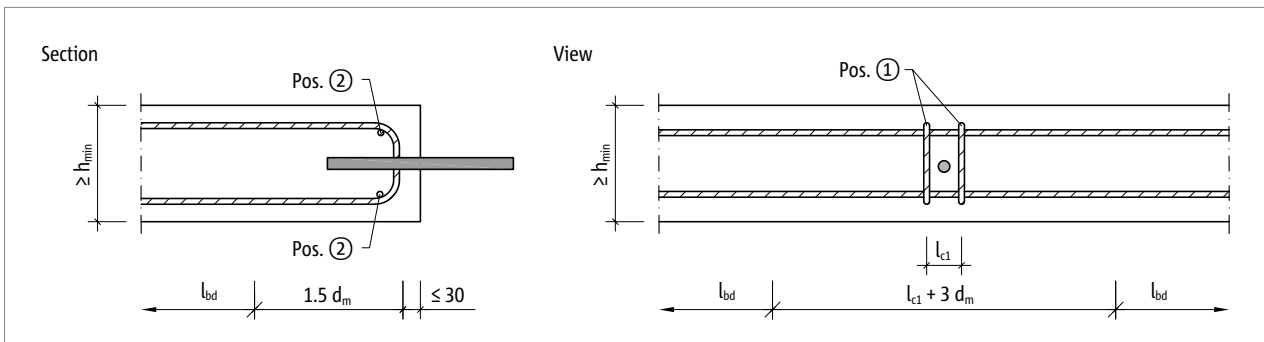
On-site reinforcement with Schöck Stacon® type LD
